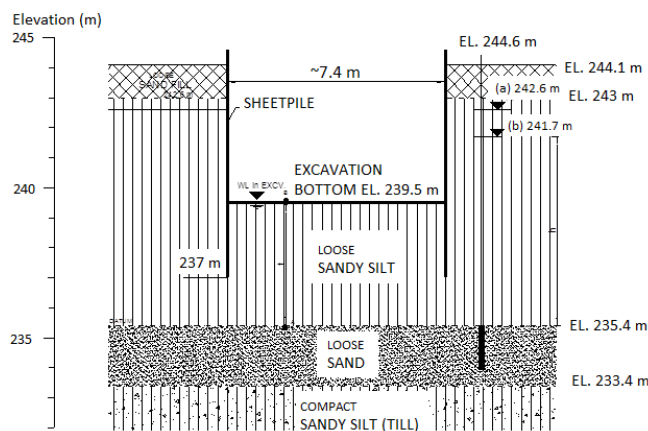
Cofferdam excavation in sandy silt overlaying a sand layer (KB-06-3, GI 2007)
